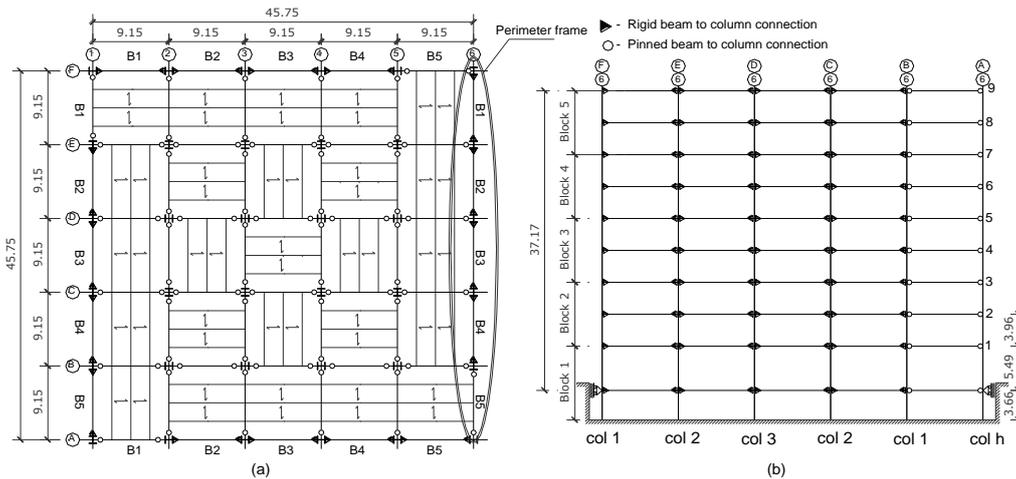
(a) Typical floor plan of the building with perimeter MRFs and (b) perimeter frame elevation
